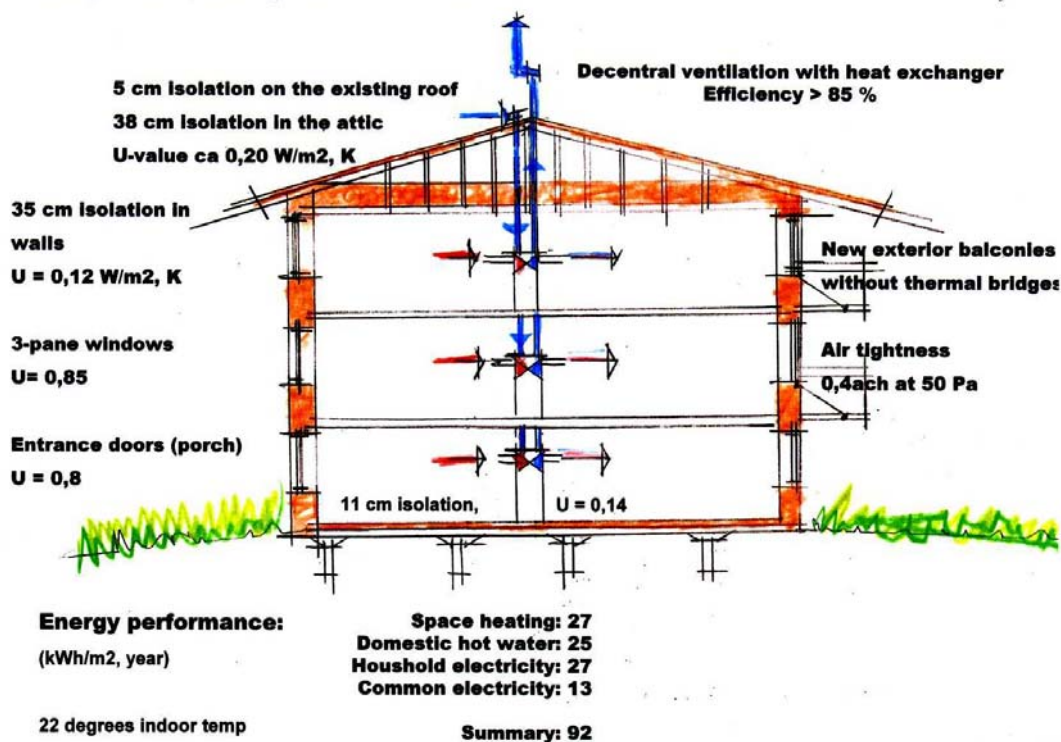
Building envelope and installations after renovation. Illustration by Hans Eek.
